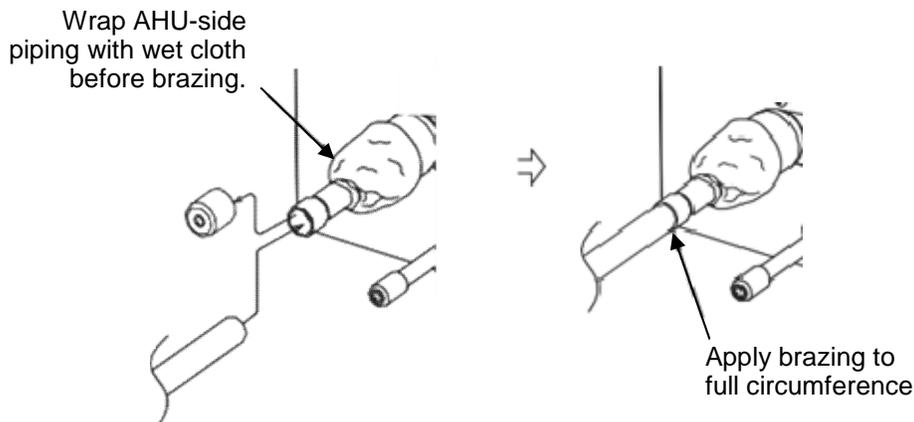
Connection of Refrigerant Piping—Brazing Details
